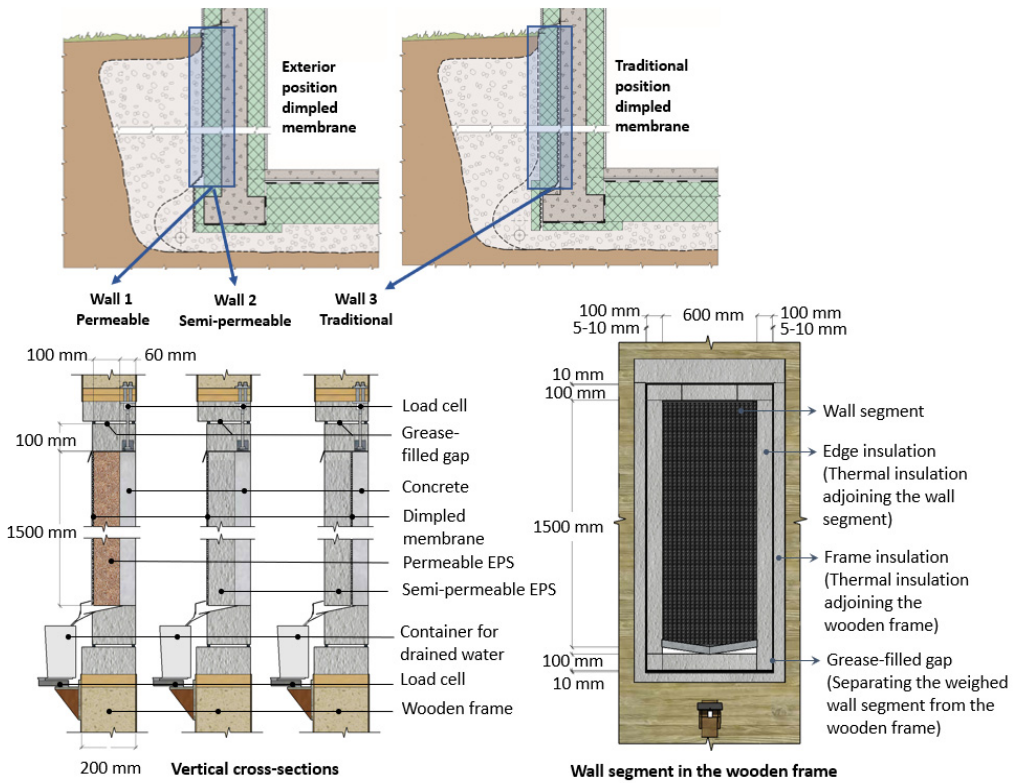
Diagrams of wall segments showing dimensions, material configurations, and one wall segment positioned in the wooden frame.
